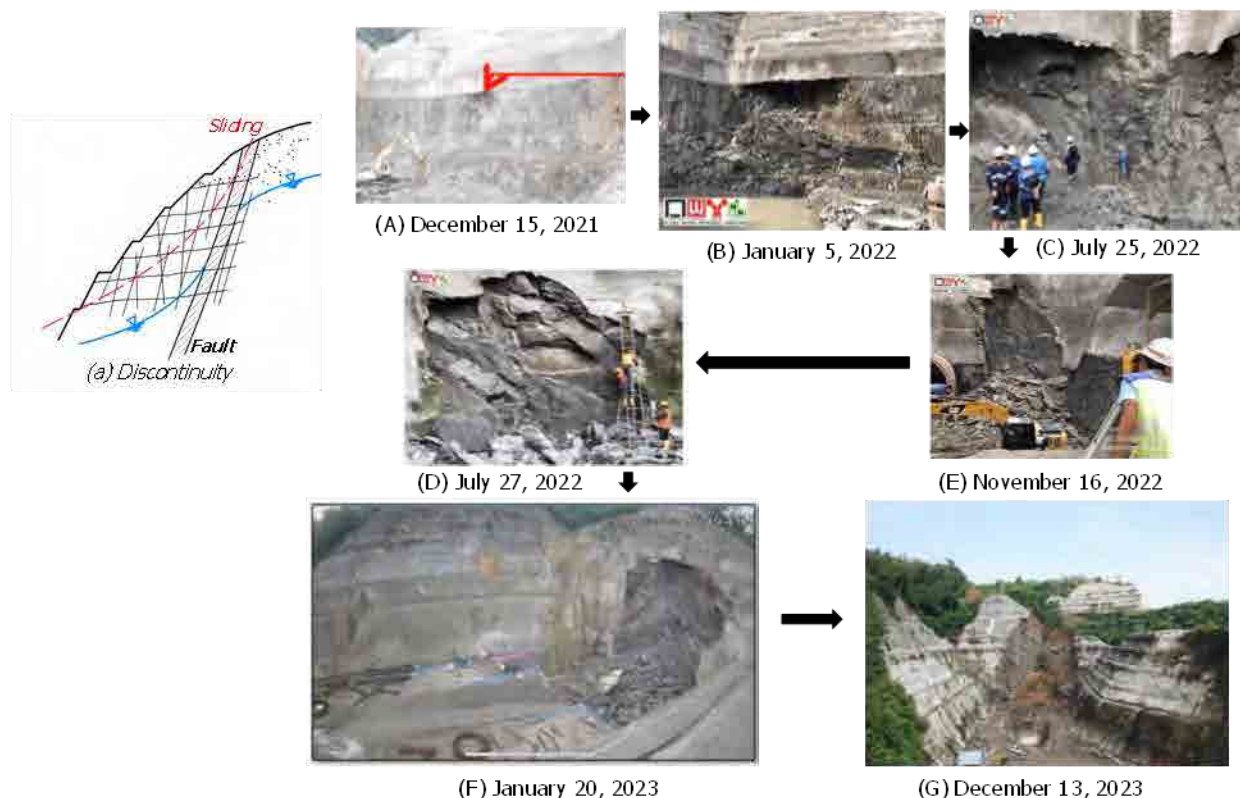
Large-scale Sliding Occurred on Cut Slope (Rukoh Dam)
